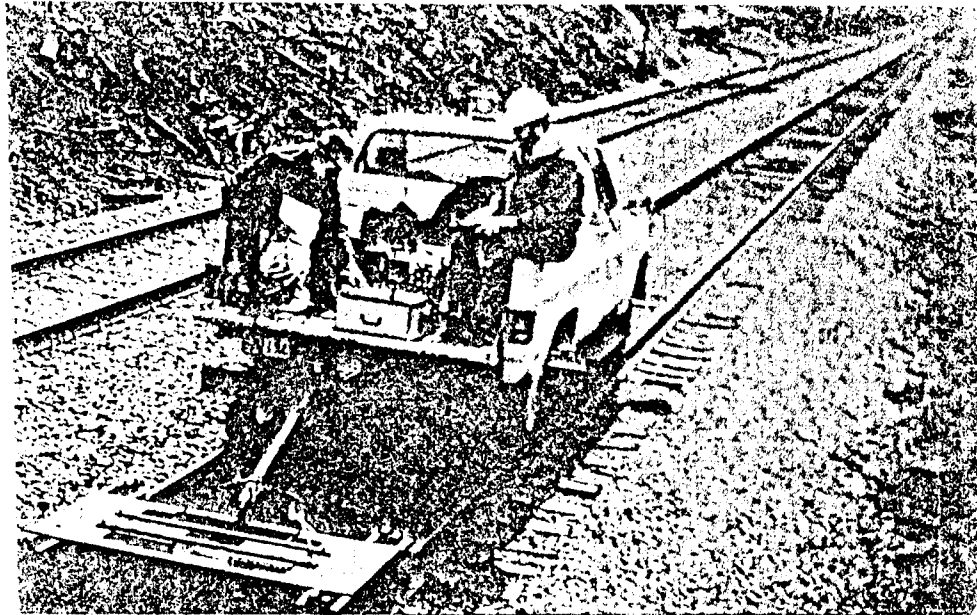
Profiling ballast and sub-bed conditions on rail road tracks by Ground Penetration Radar (GPR).
